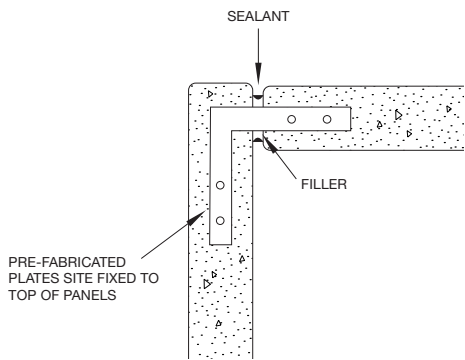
Plan View – Panel to Panel Top Corner, L-Plate Restraint. (Plate bolted to cast-in ferrules to top reveal faces of panels)
